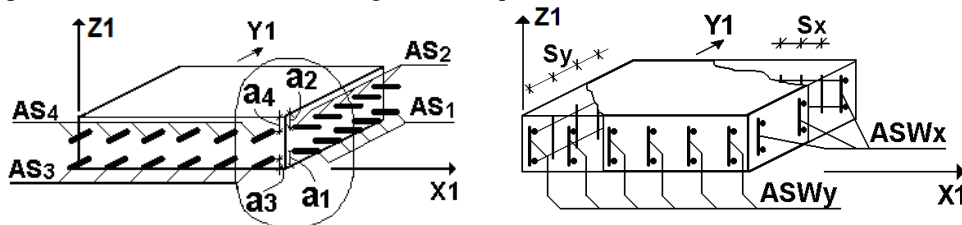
Reinforcement layout in sections of a finite element of a slab and shell
